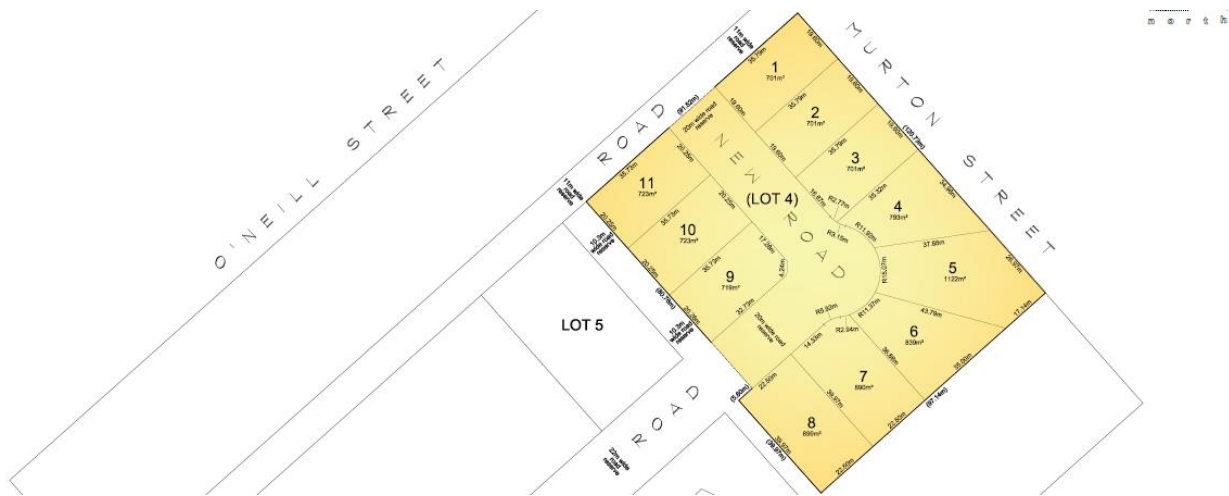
Plan of Subdivision for 331 Murton Street, Broken Hill (Source: MH2 in DA2022-21)
